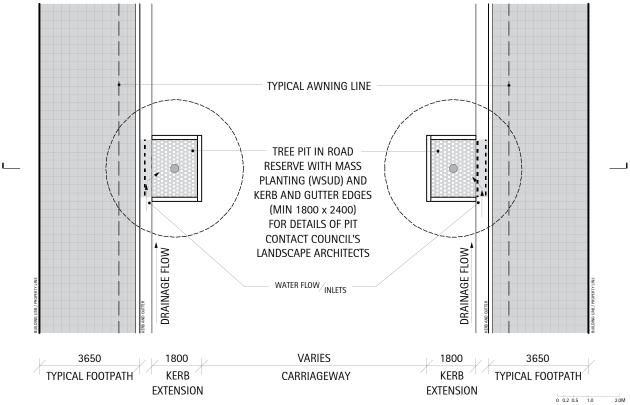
Street Tree Typical WSUD Pit Location in Roadway
